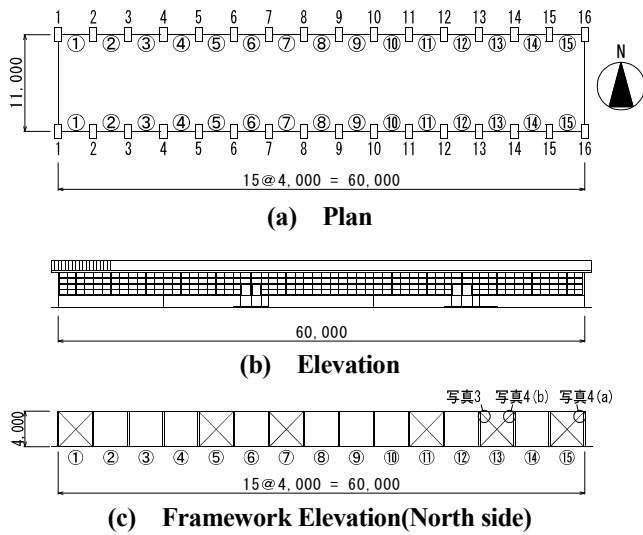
Plan and Elevation of the Practical Factory(Unit[mm])
